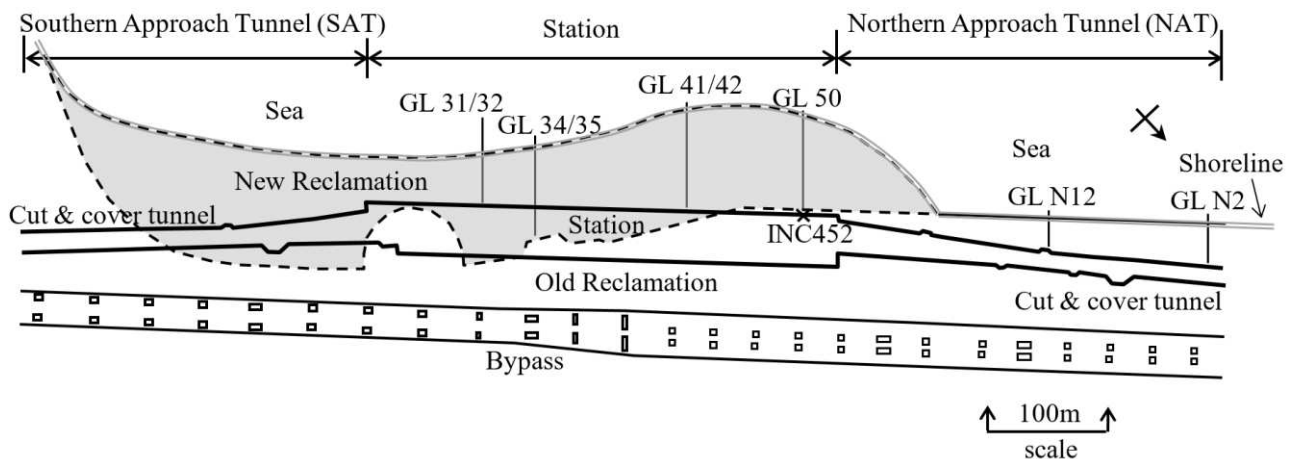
Layout plan of the Tsuen Wan West project (after Pickles et al, 2006); GL = grid line.
